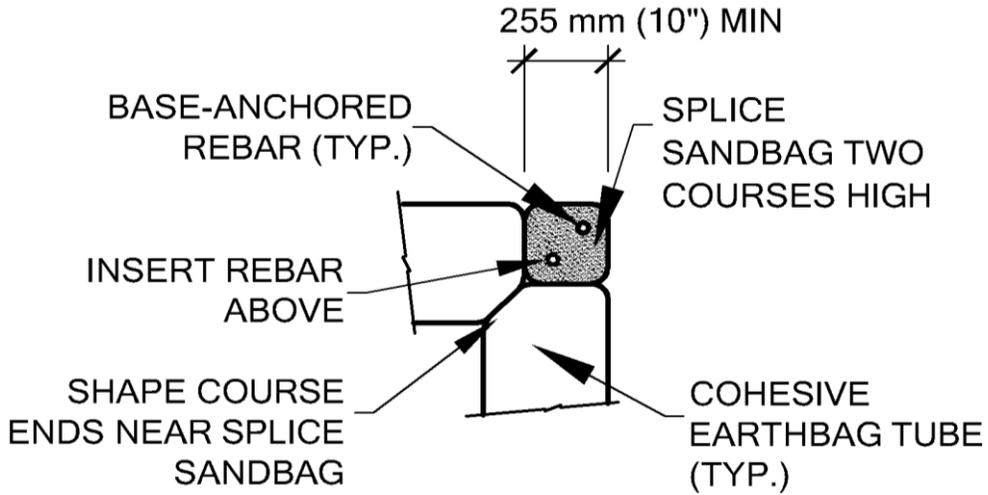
Covered splice sandbag location at mid-story height of external wall corners.
